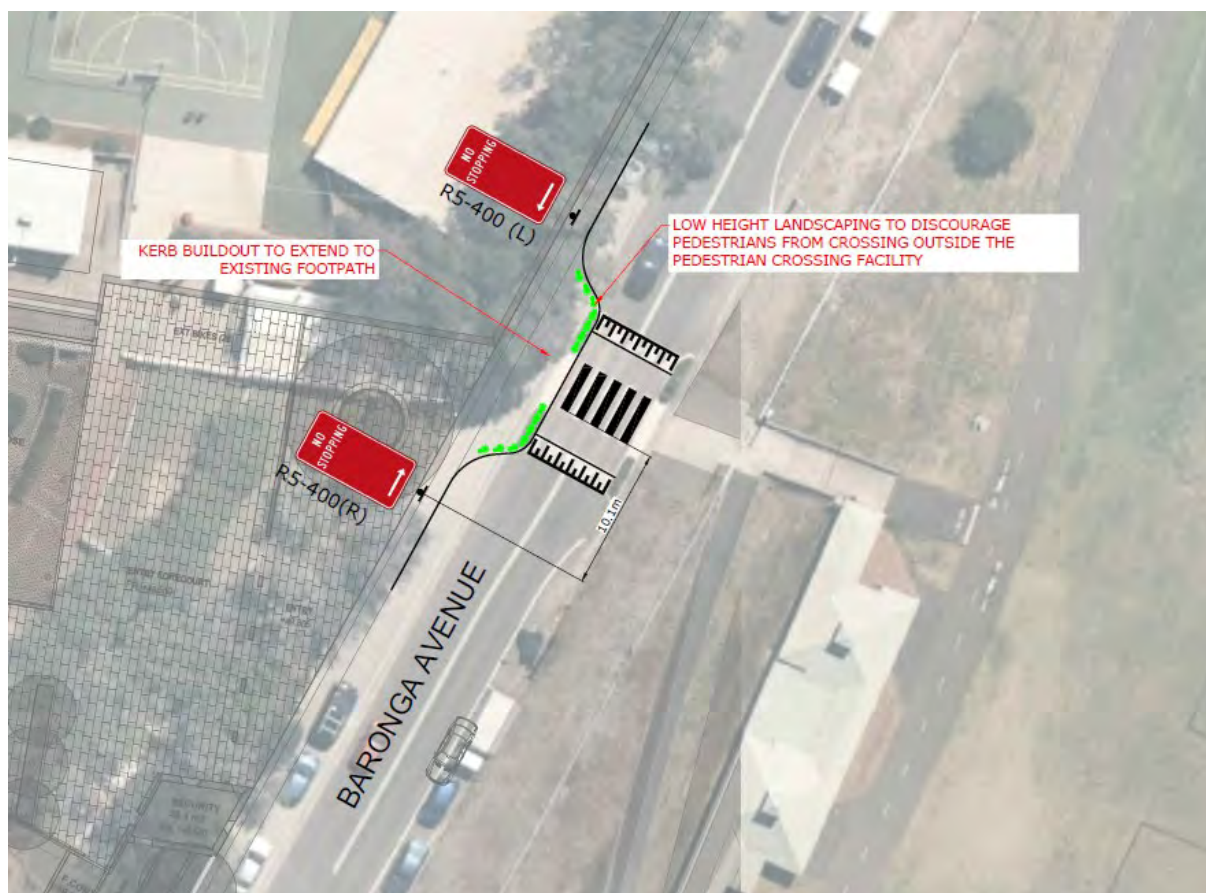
shows the proposed concept design of Baronga Avenue pedestrian crossing extension. The design involves reconstruction of the kerb buildouts to connect with the existing footpath and the extension of zebra crossing markings. This design would provide continuous path for pedestrians across Baronga Avenue and would stop vehicles from travelling in between the pedestrian crossing and footpath.
